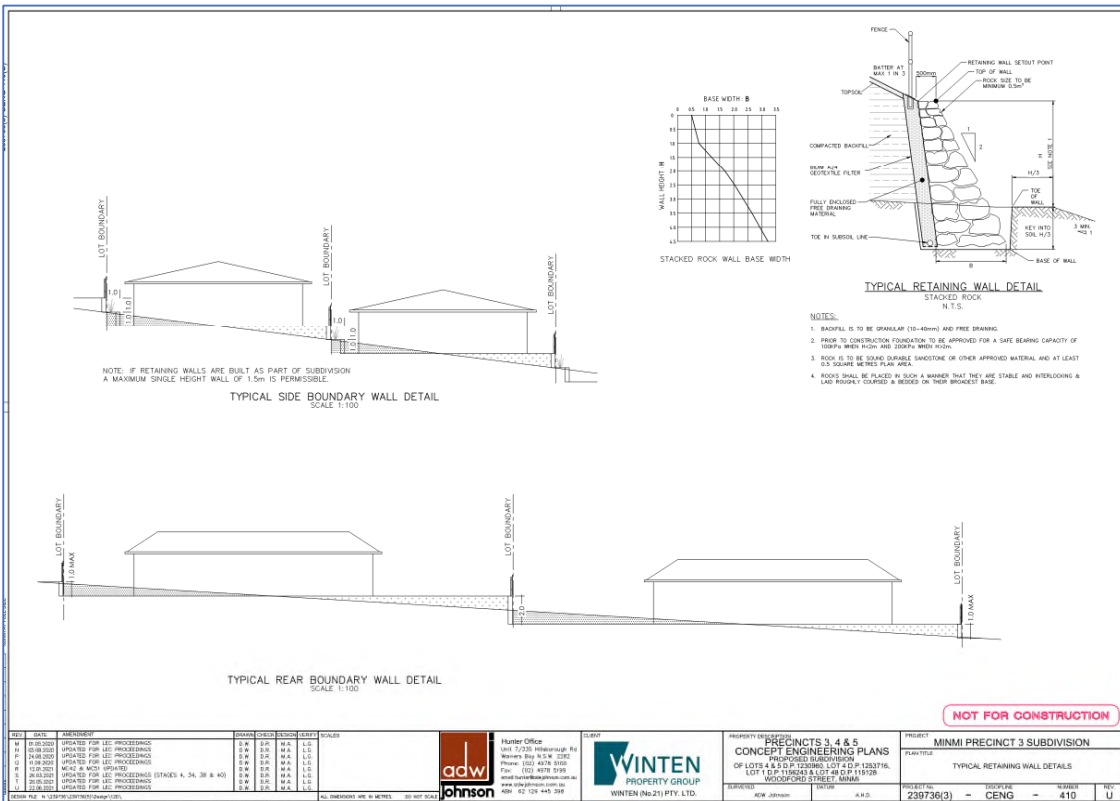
(Typical Sections Lot Benching (Source – Concept Engineering Plan Sht 410)
